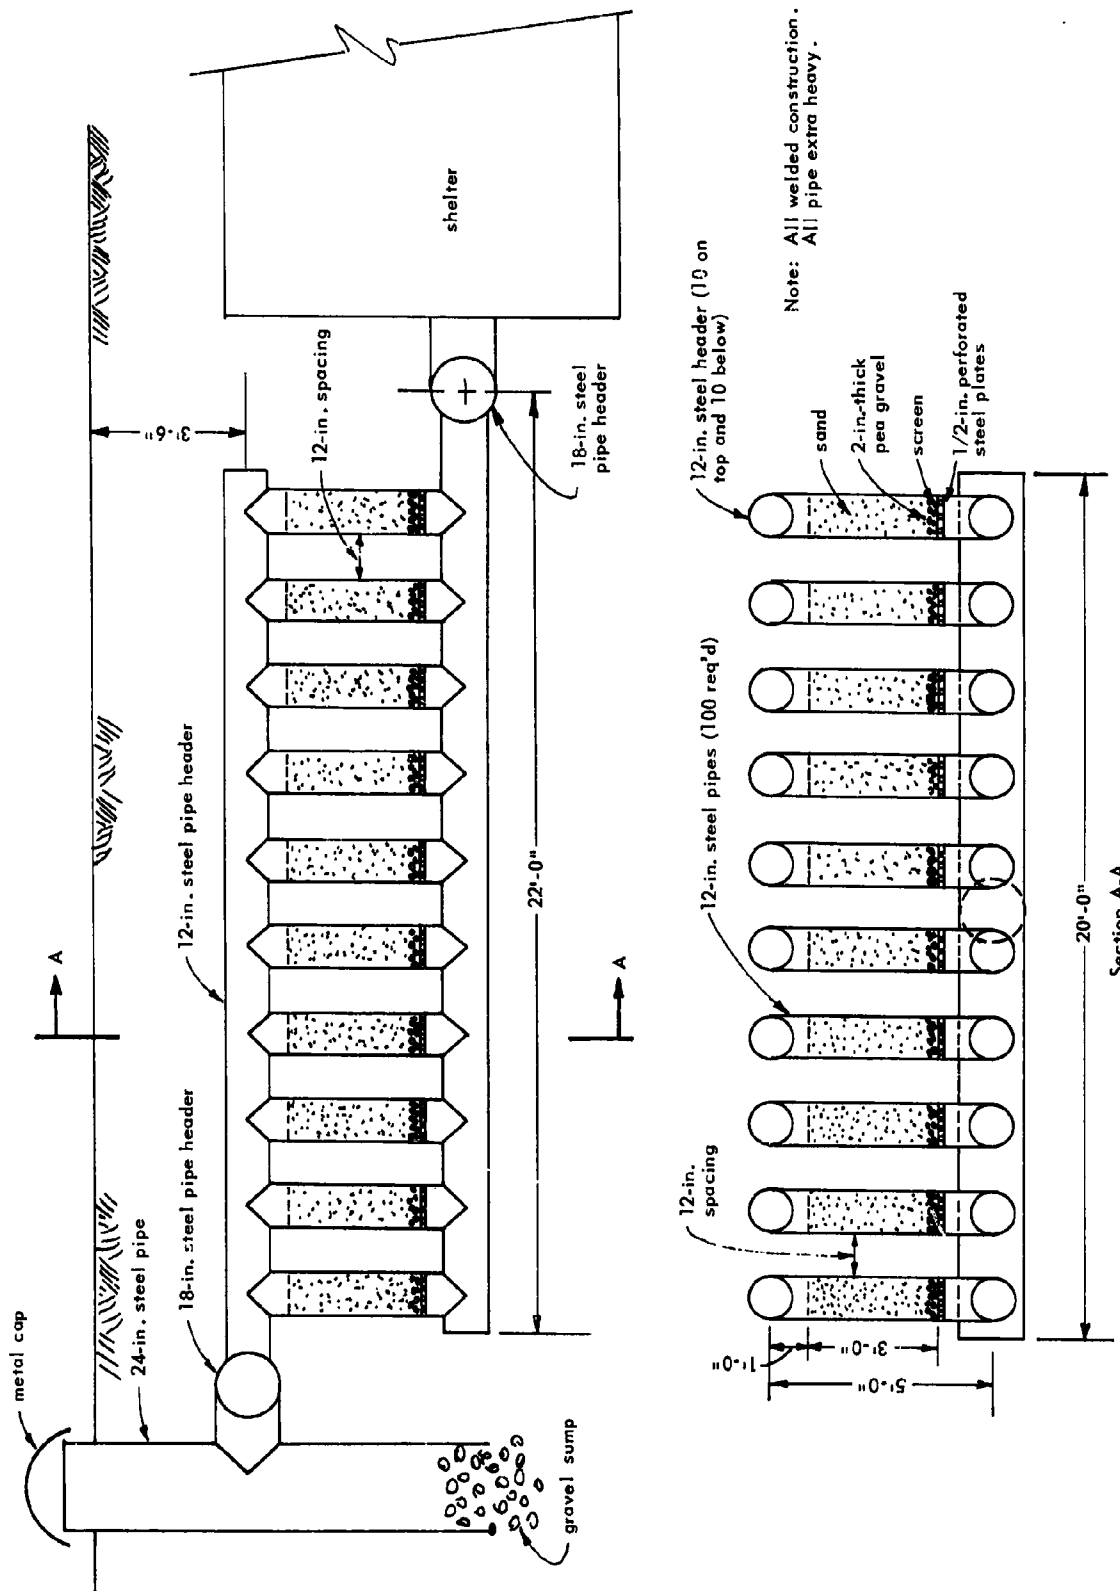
Sketch of heat sink for 300-cfm sand filter.
